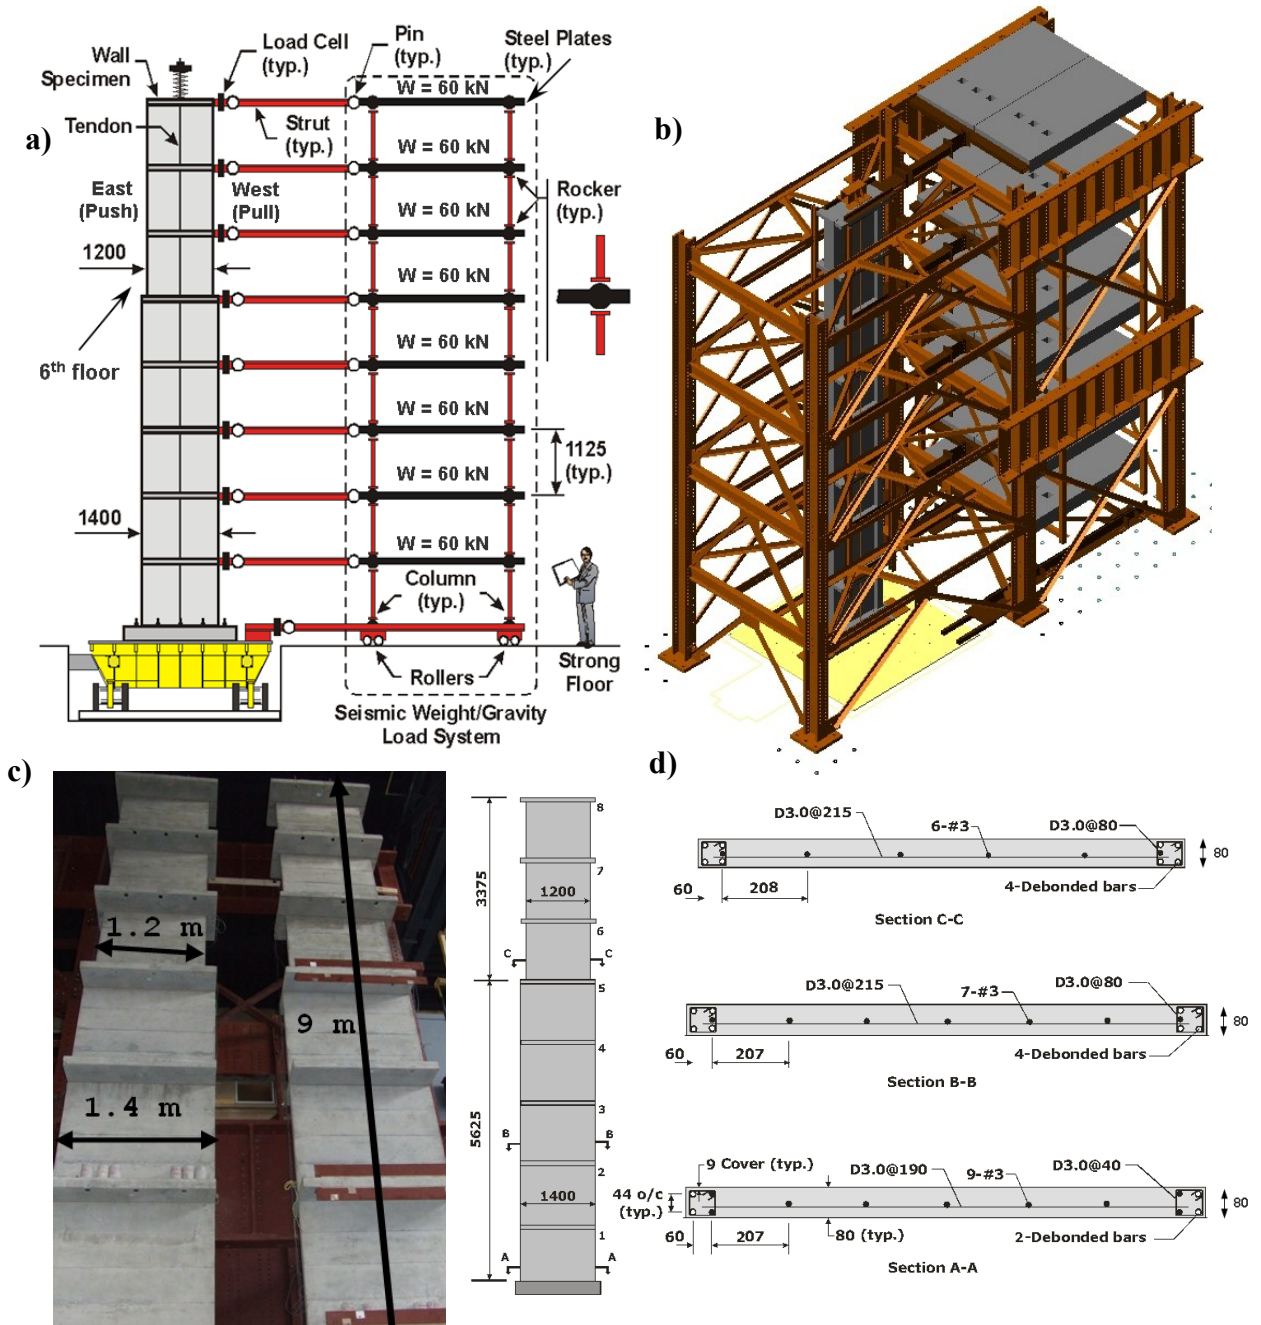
a) Test specimen and seismic weight/gravity load system; b) Complete test setup with stabilizing steel frame; c) model wall; and d) Cross section of model wall.
